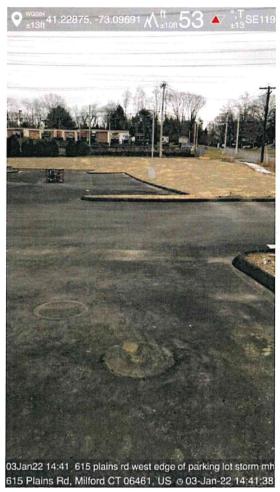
Facing southeast towards Raton Dr. Two(2) manholes for stormwater system.
